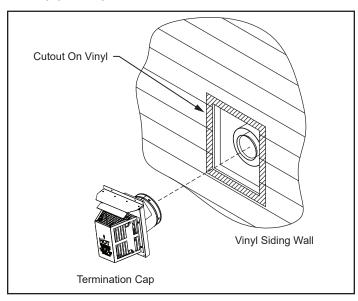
Horizontal Termination Cap on a Vinyl Siding Wall
